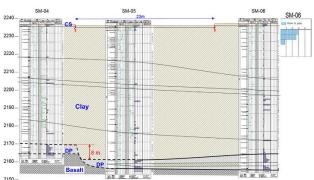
Cross section of subsoil, Deportivo Cananea site.
